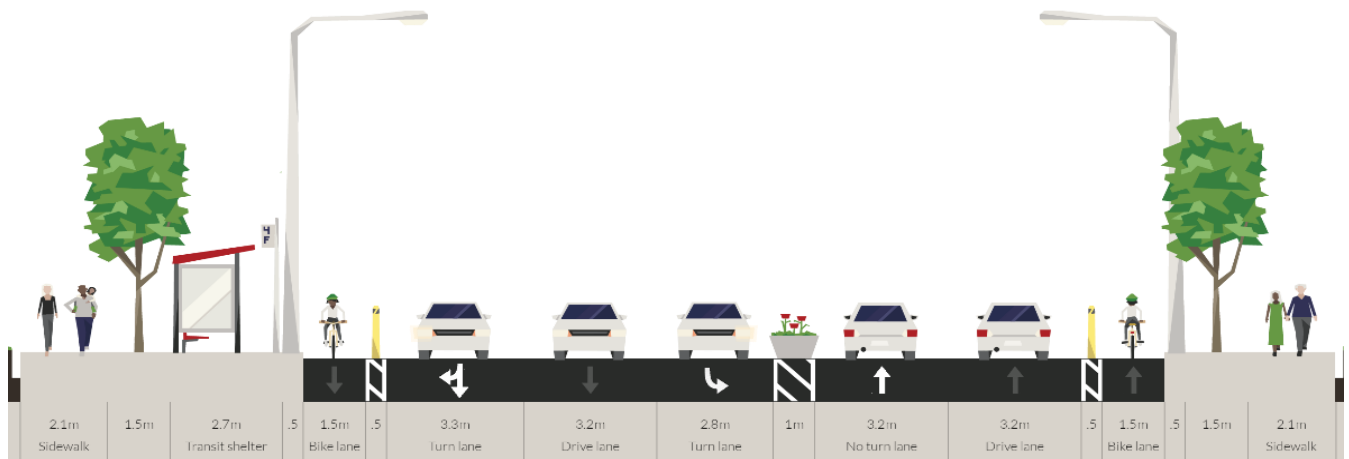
Recommended Cross-section of Yonge Street at Sheppard Ave. (Looking North)
